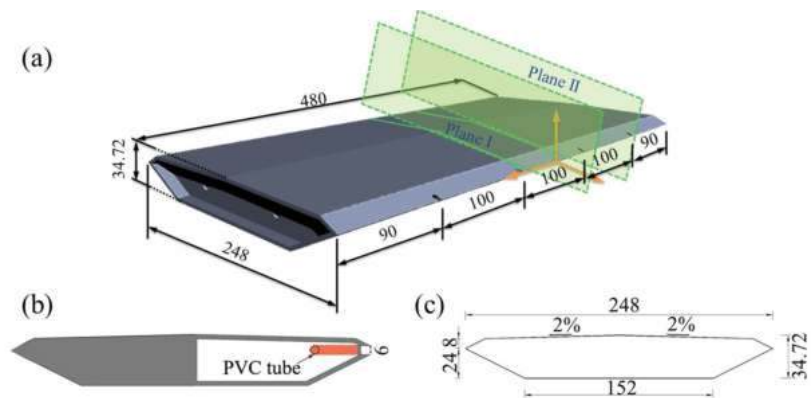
The geometric scale of the present test model (unit: mm). (a) The three-dimension view, (b) cross-section in plane I, (c) cross-section in plane II.
